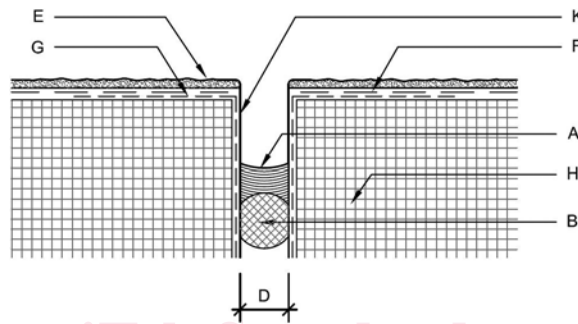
Recessed Sealant Butt Joint Seal (EIFS to EIFS)
